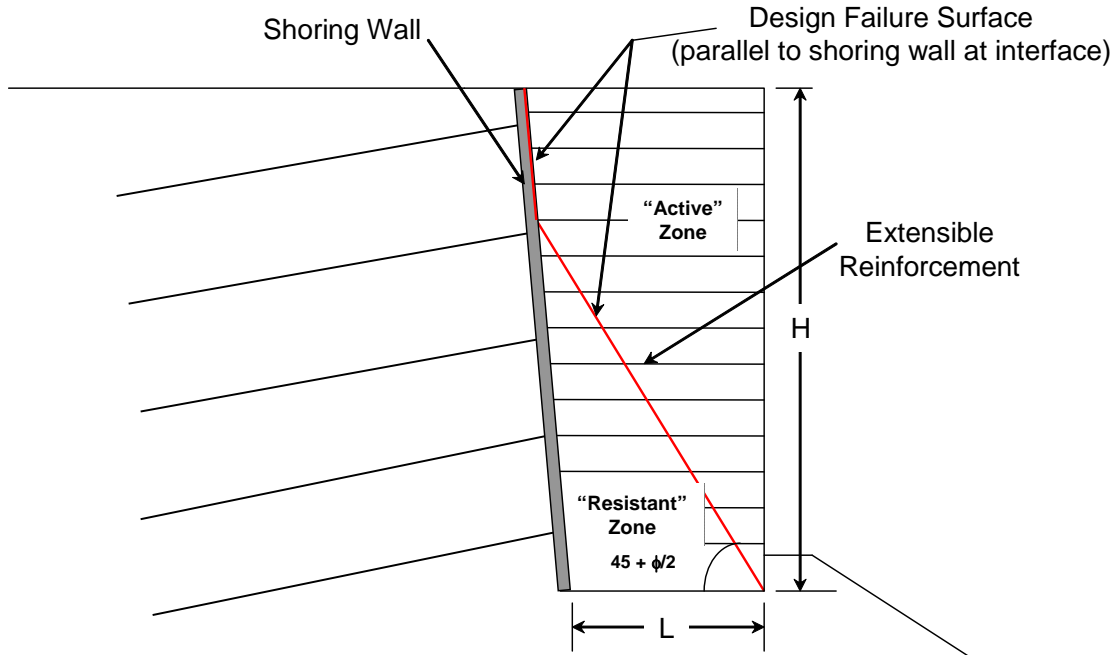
Diagram. Location of potential failure surface for internal stability design of MSE wall component with extensible reinforcements.
